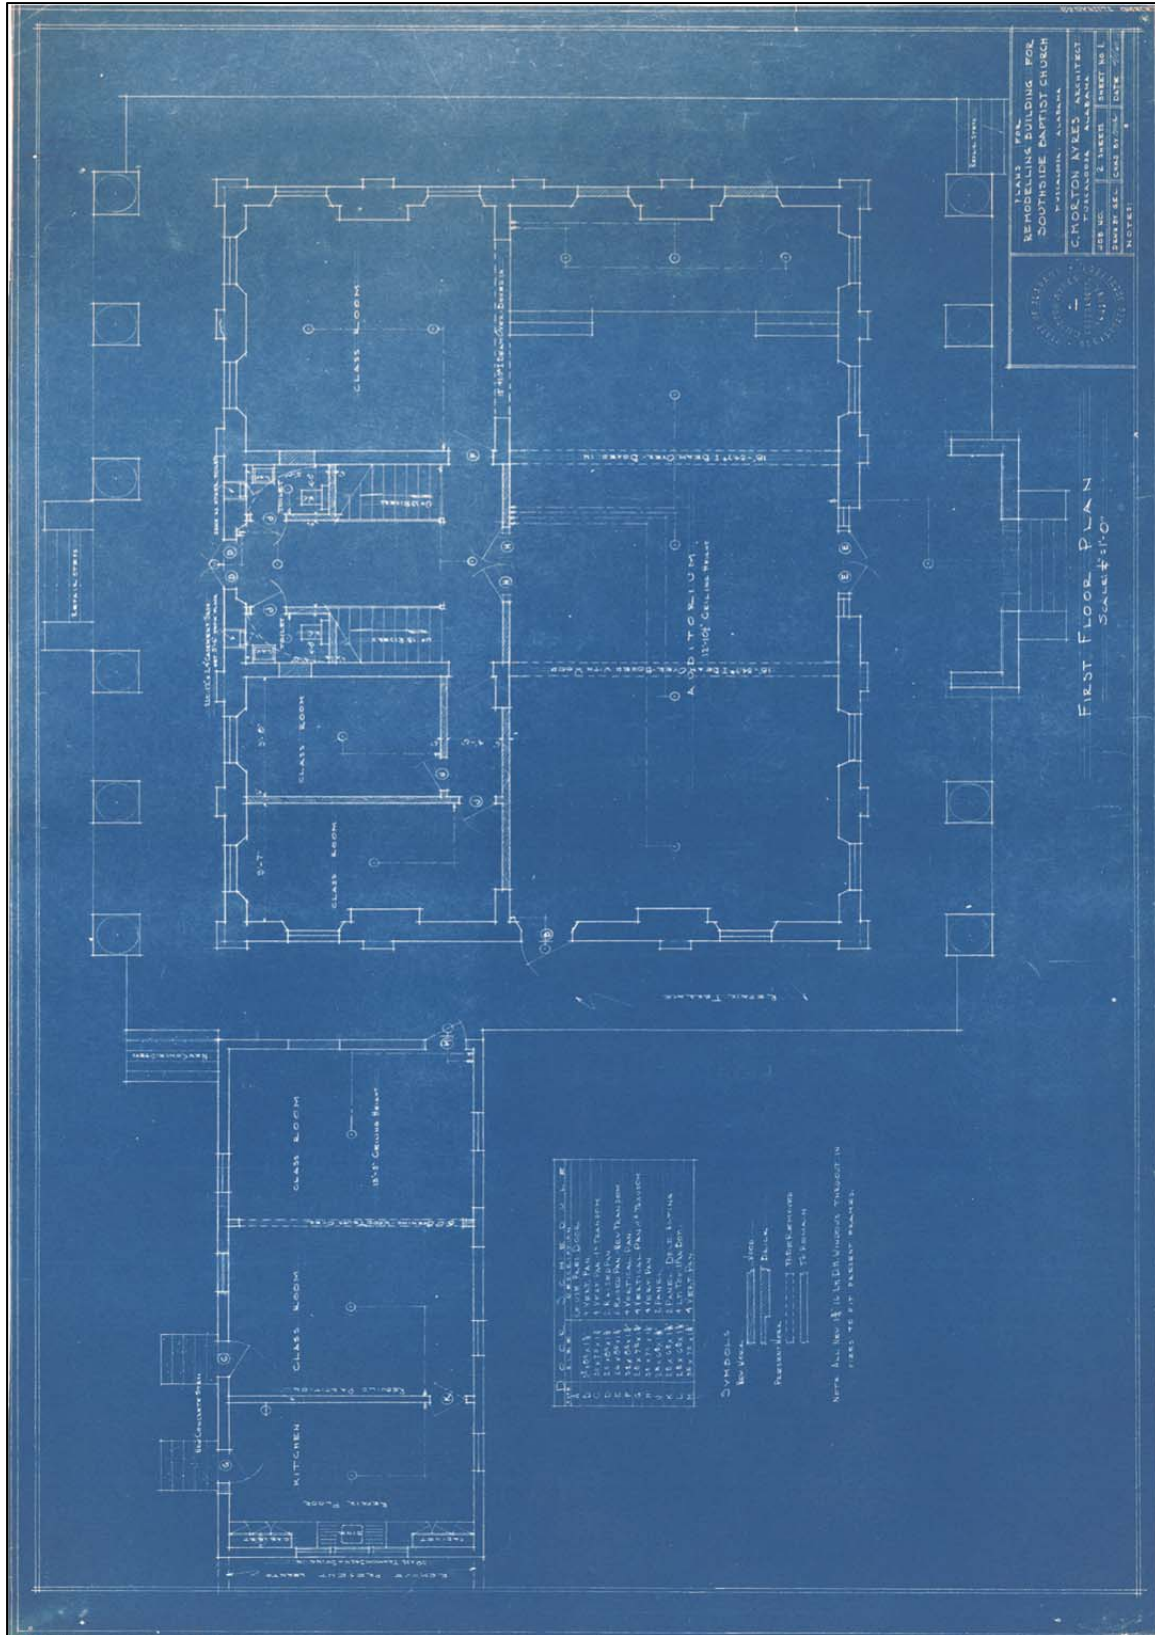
First Floor Plan, Southside Baptist Church alterations to the Drish House (Ayers 1940).
